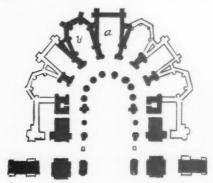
CHOIR PLAN, ST. JOHN'S CATHEDRAL, NEW YORK, Parts erected shown in black.
